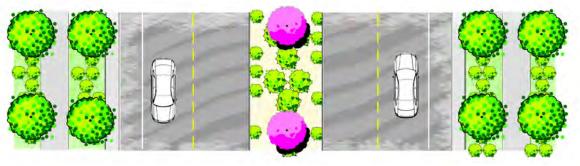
New Placerville Road (Major Arterial-Street Section P)
